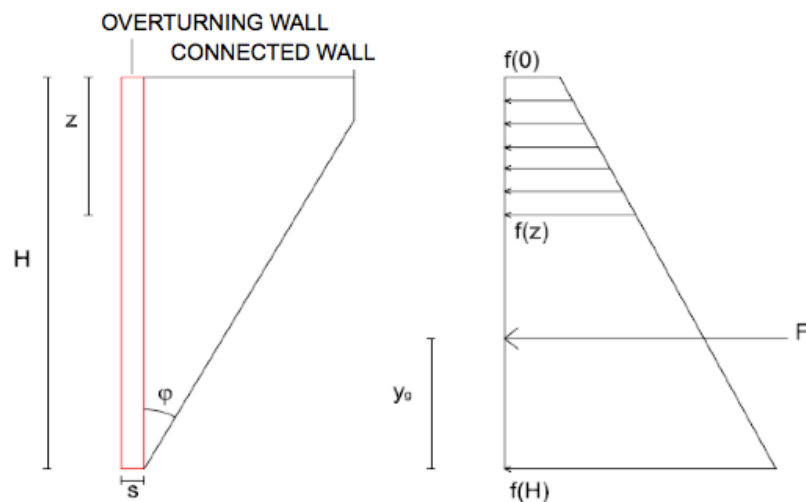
Distribution of the resistance force per unit of length due to the good connection between facade and internal wall
